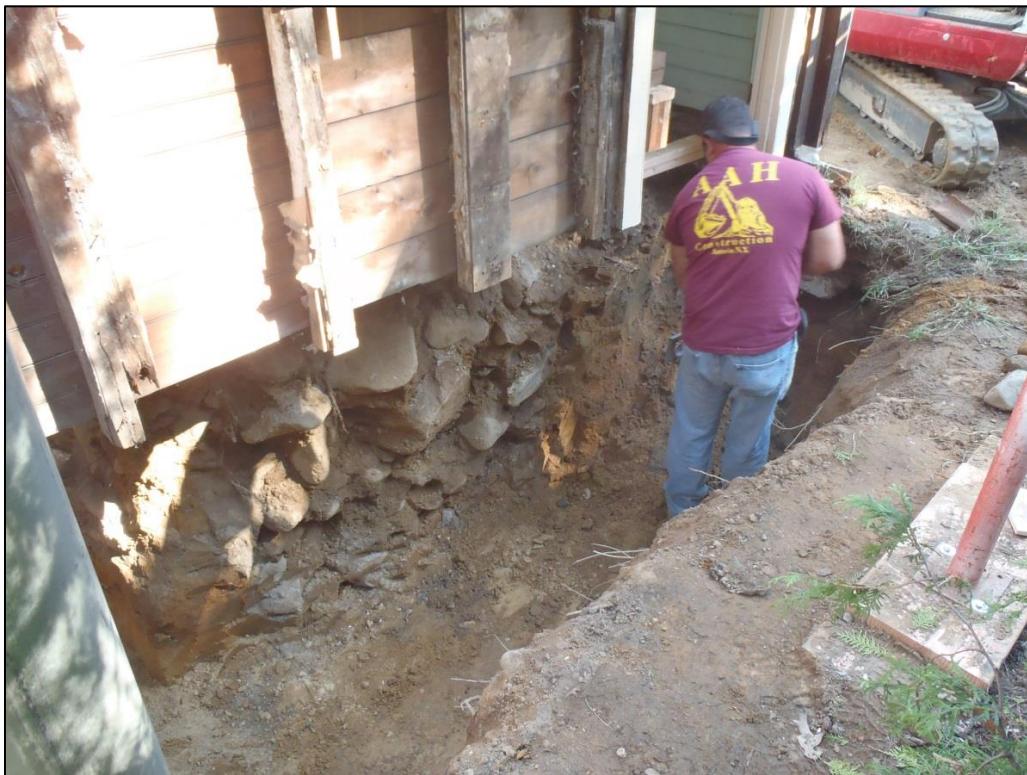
Trench 3 – Excavation in progress; southern house exterior, Room 115 foundation stones in profile.
